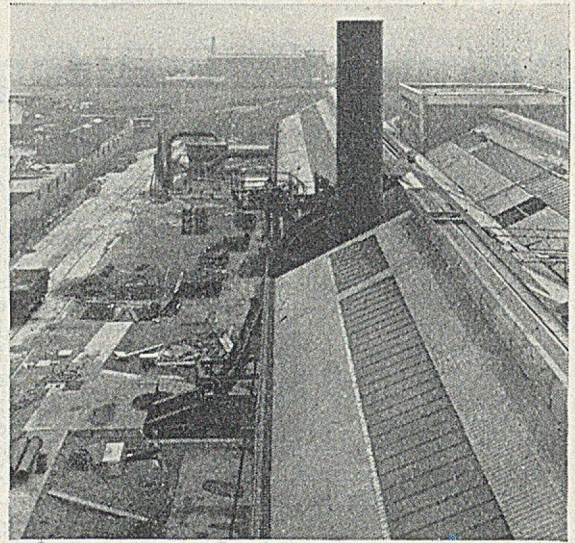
Side View of the Swivel-hoist Mechanism taken looking over the Foundry Roof during Constructional Work.
